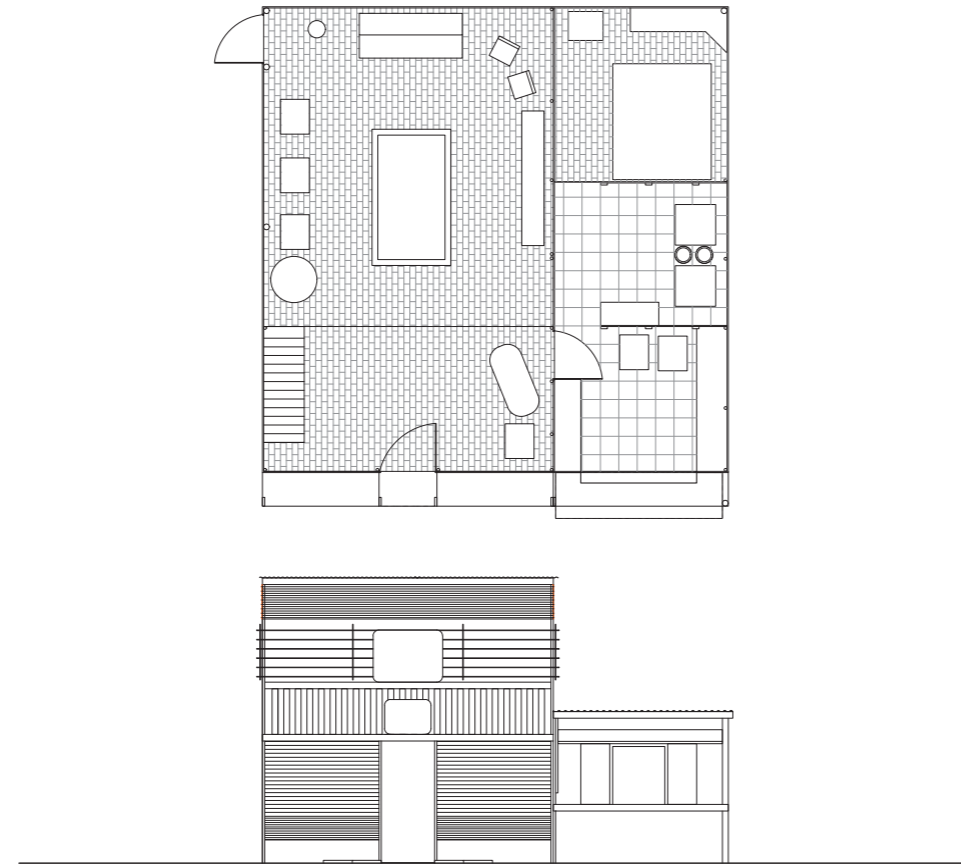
As built drawings for Roy's dwelling (Author 2022)
